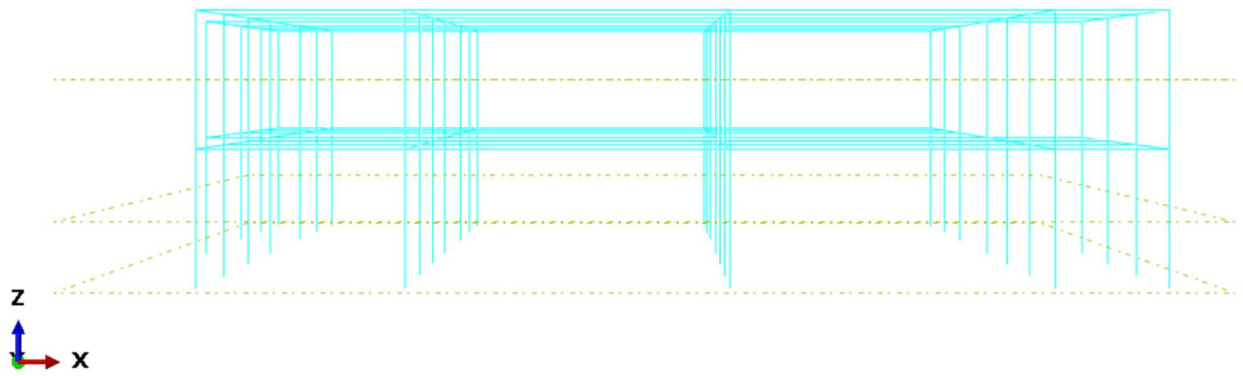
Display of the 1D quadratic line element mesh for the first floor, second floor and roof beams and columns.
